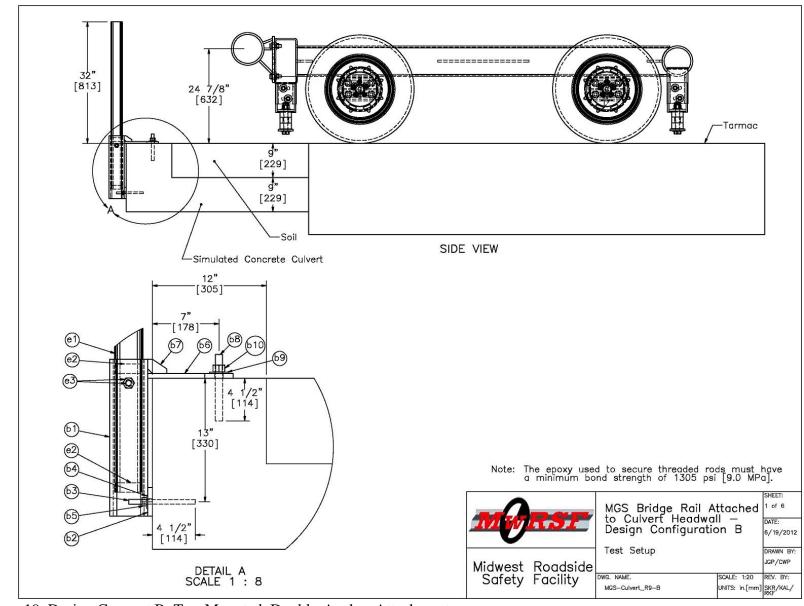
Design Concept B: Top-Mounted, Double-Anchor Attachment
